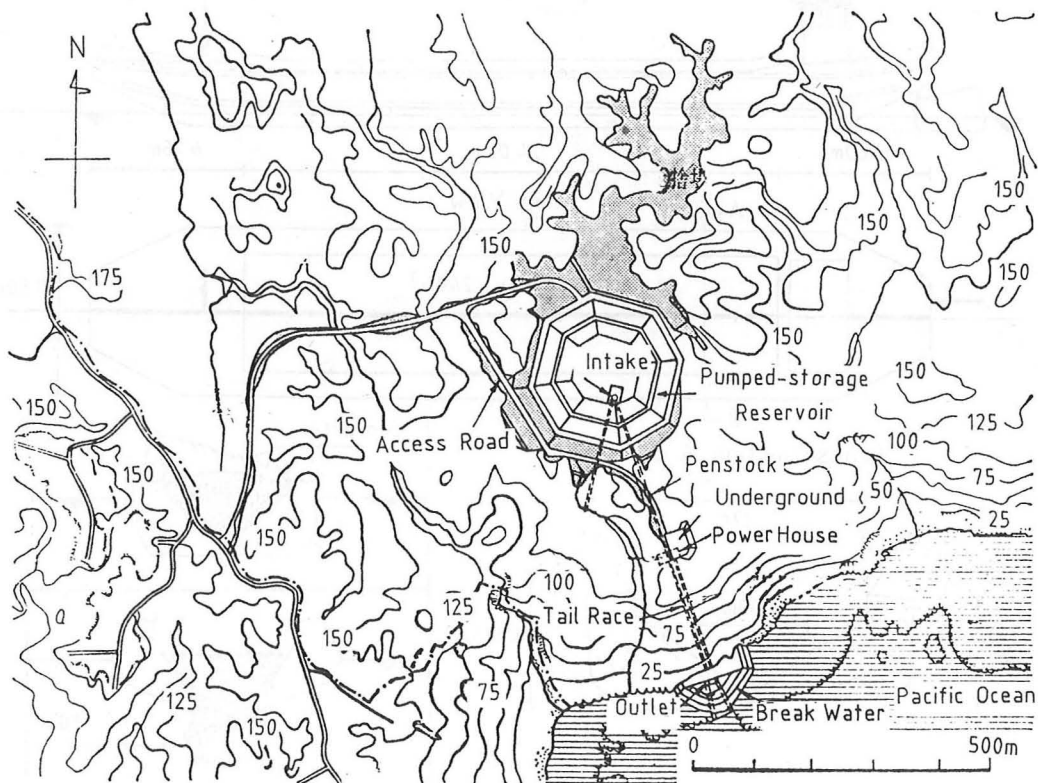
Site Plan of the Sea Water Pumped- Storage Project (Ref. 4)
